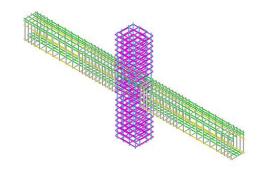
Emulatif precast concrete beam-column joint reinforcement model
